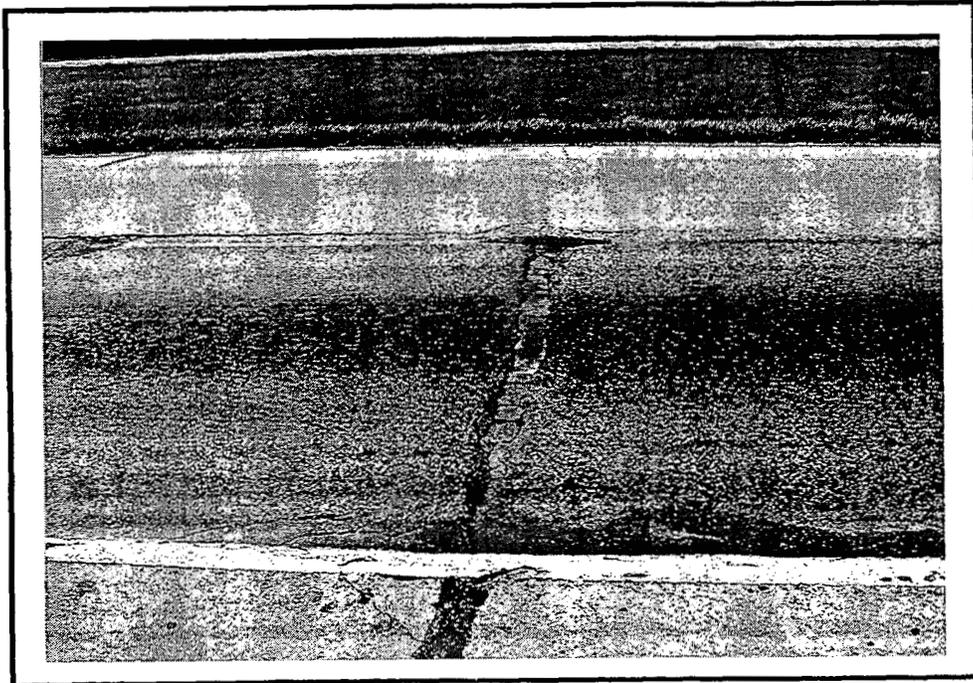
Jointed Base, Reflection Cracking in Composite Pavement, High Severity
